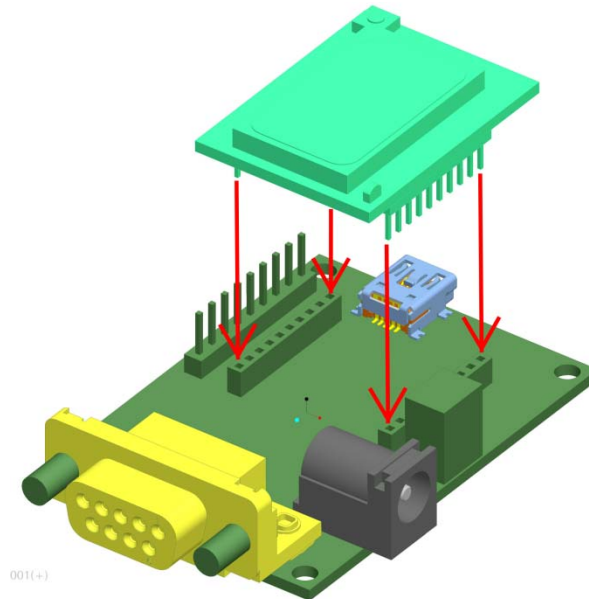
Example of the GWT154 Radio Module mounting to a Host/Carrier Board
